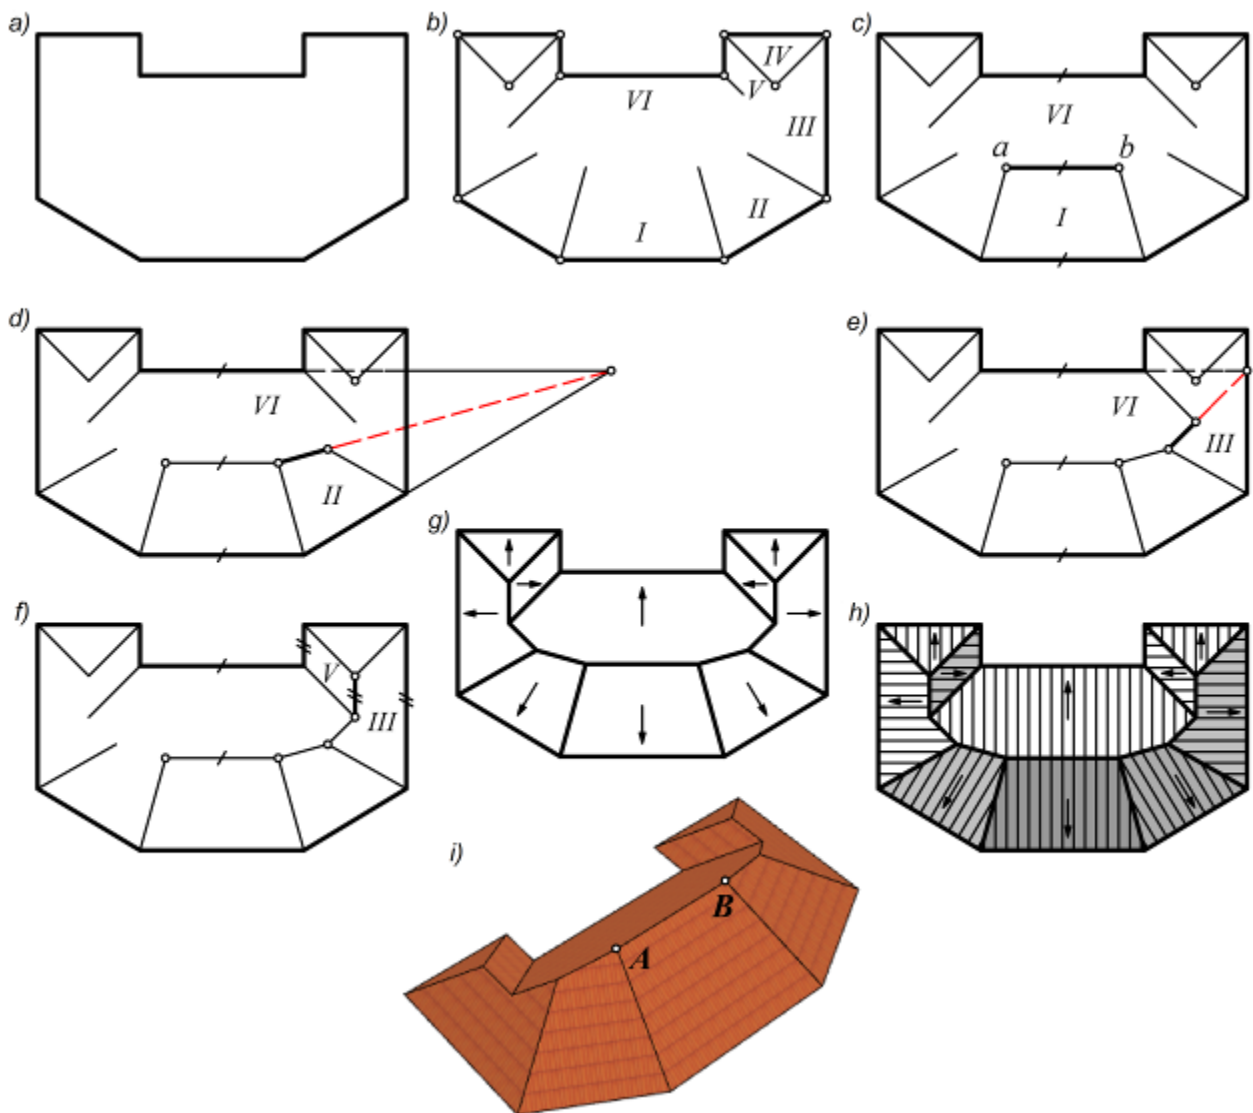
Step-by-step construction of the roof plan and the view of the roof in perspective
